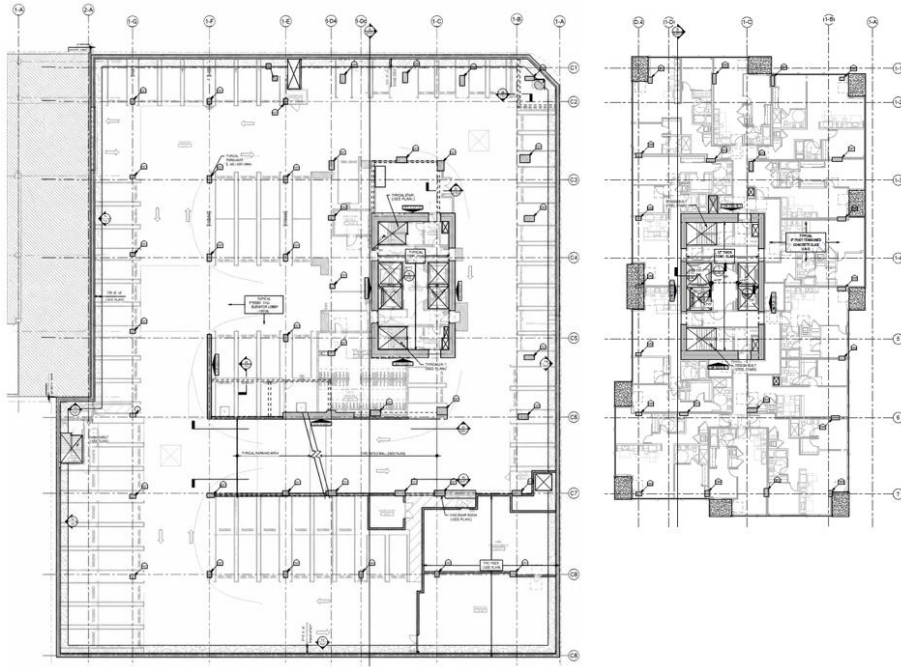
30-story RC core-wall building: plan view of basement floors (left) and plan view of typical tower floors (right)
